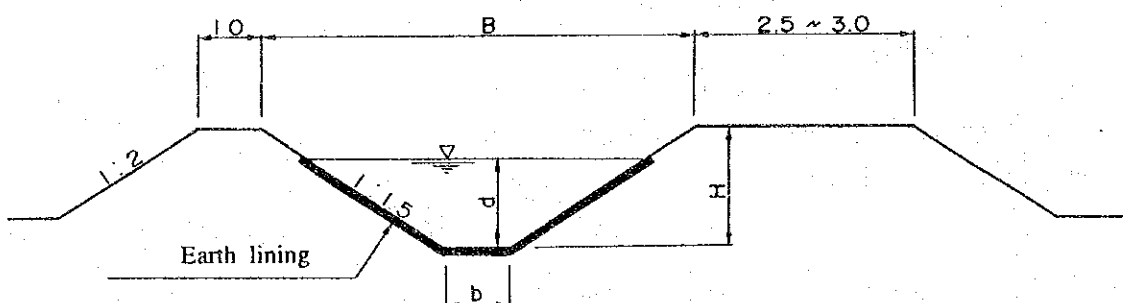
Typical Cross-section of Branch Irrigation Canal
